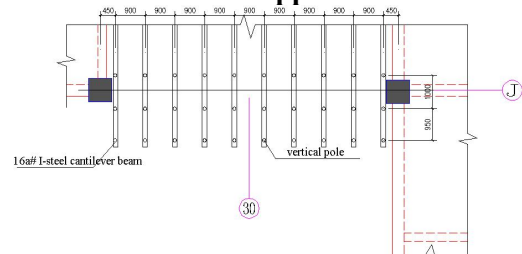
Schematic Plan of Cantilevered Steel Beam at +26.650m
